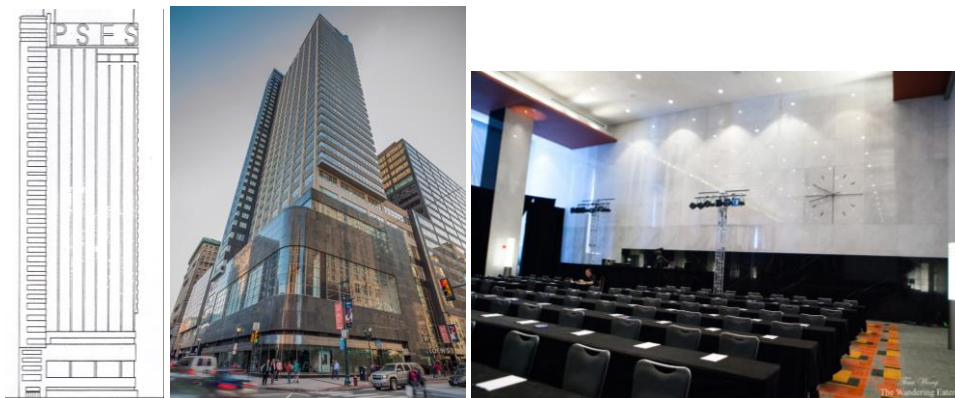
The Loews Philadelphia Hotel: a) façade; b) hotel building; c) Millennium Hall
